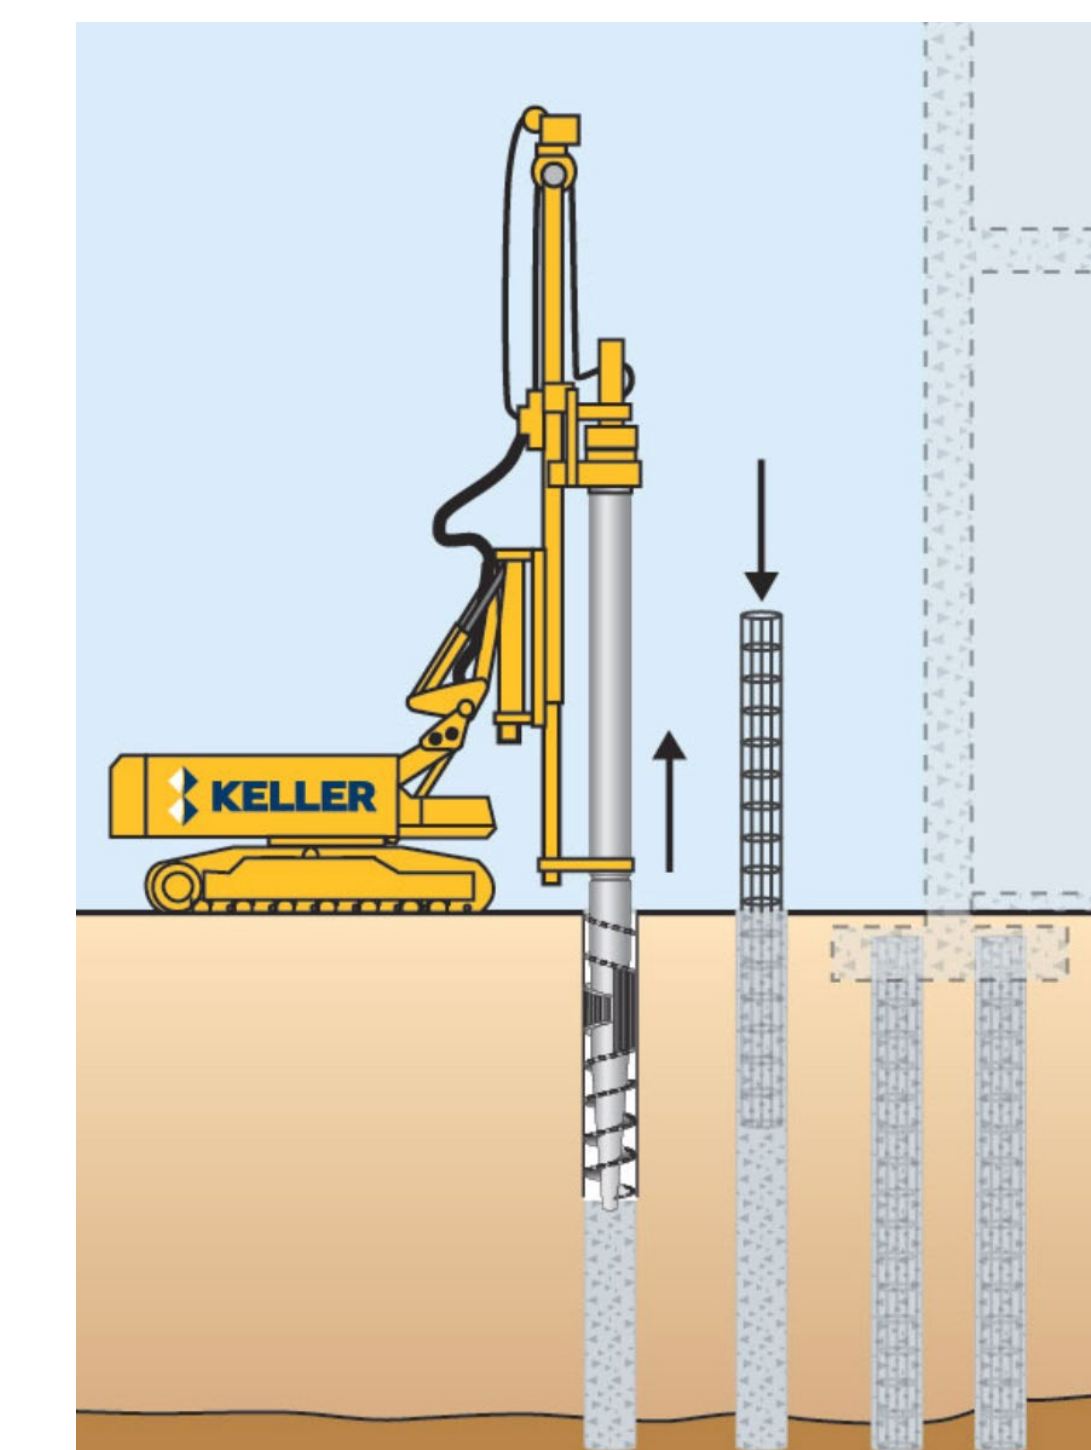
Drilled Shafts – soil is removed with an auger and filled with concrete and reinforcing steel.
